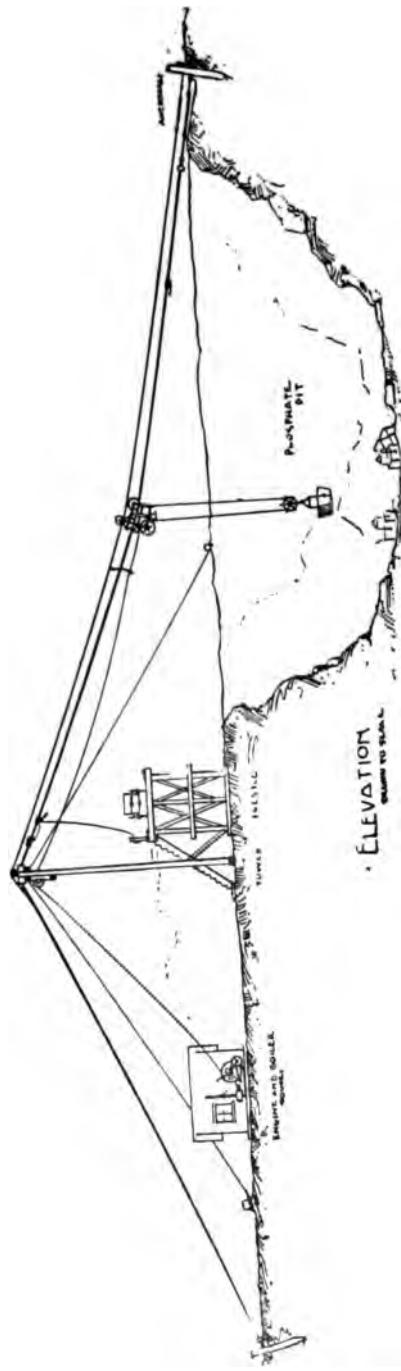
THE HARRIS-MILLER INCLINE CABLEWAY.
